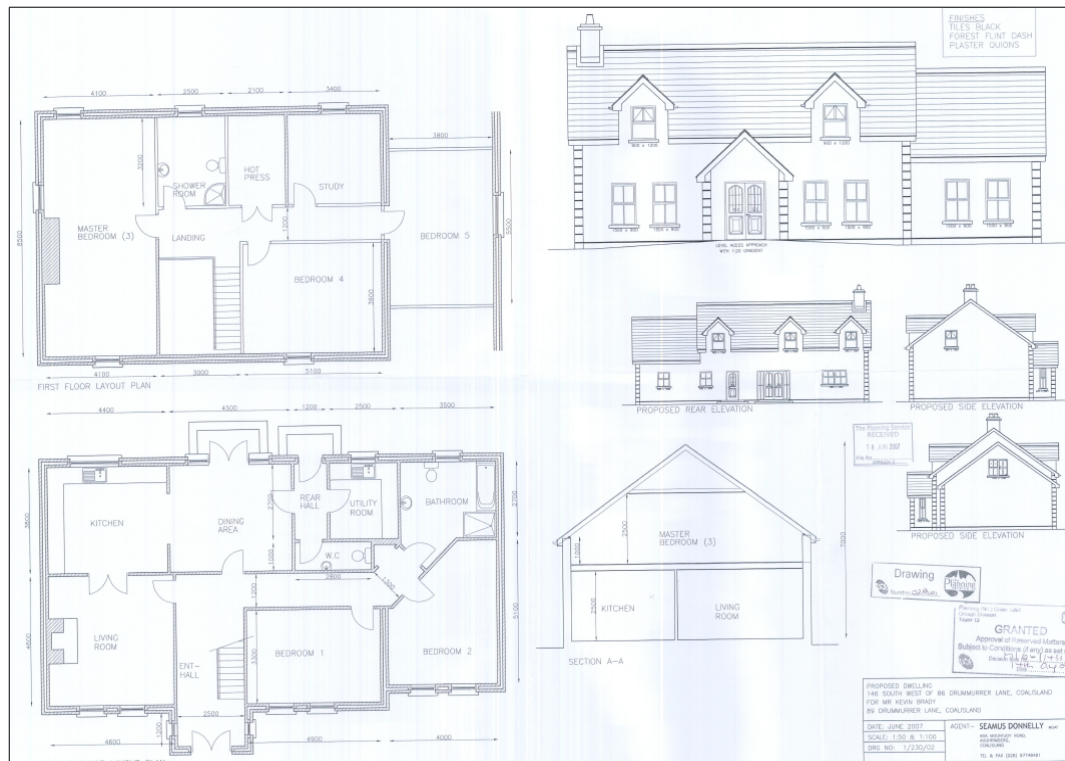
Floor plan and elevations of dwelling approved under M/2006/1433/RM
